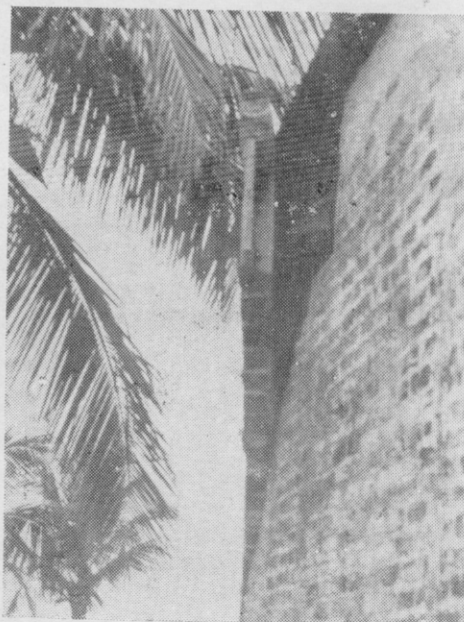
An undamaged RCC frame building with brick masonry filler walls close to most extensive ground failure at Sonaimukh.
